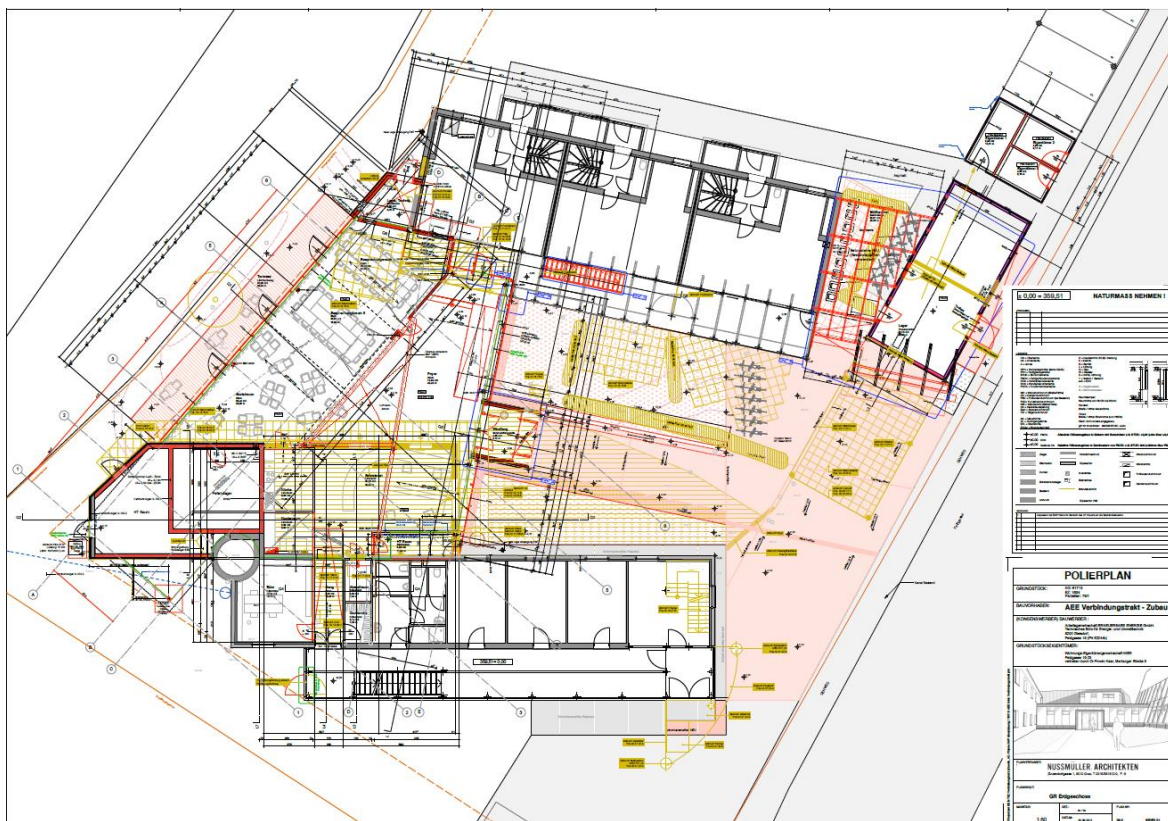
Ground floor of the connection building of office south and office north (Source: Nussmüller Architekten)
